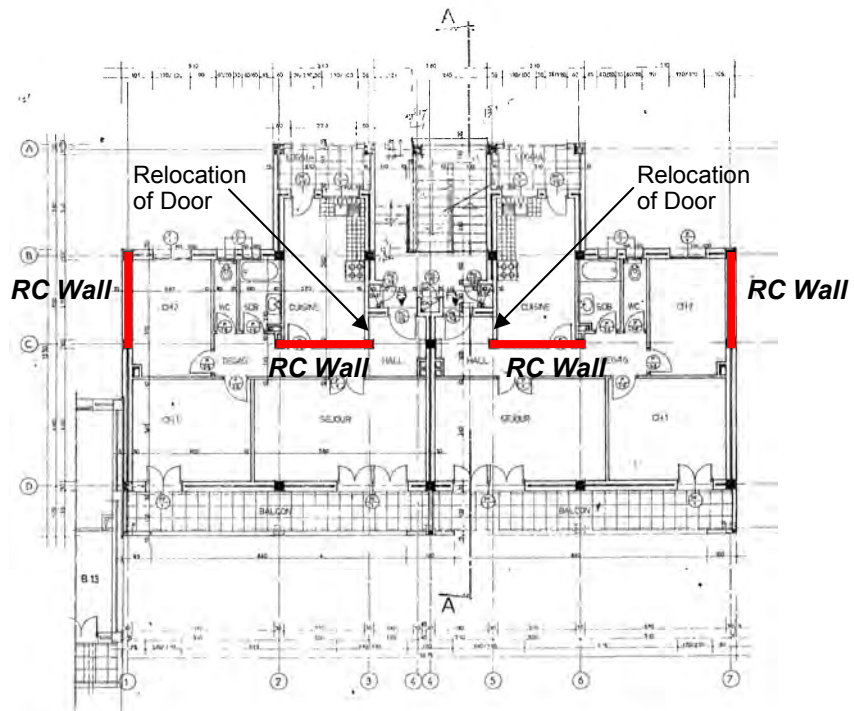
Layout of RC Walls for Retrofit at 1st storey to 4th Storey
